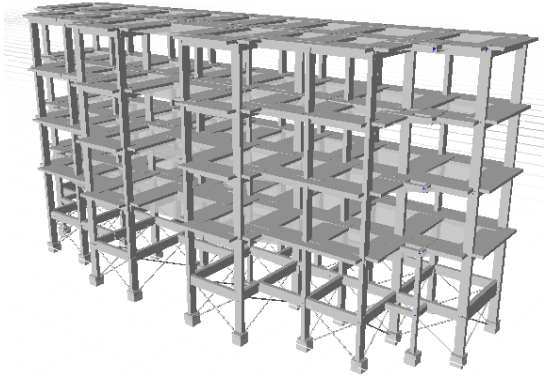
3D model of irregular plan layout, reinforced concrete 4 story residential index building with masonry infills in all stories
